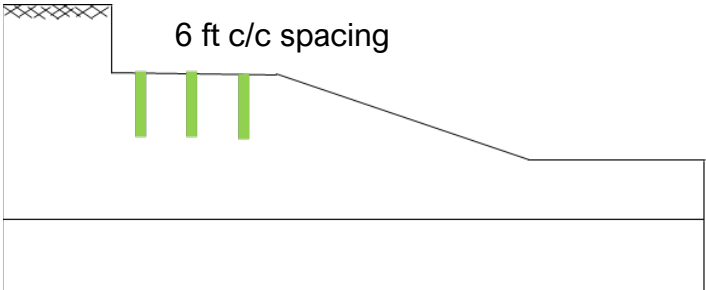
Cross-sectional view of the Slope and Possible Failure Plane.
